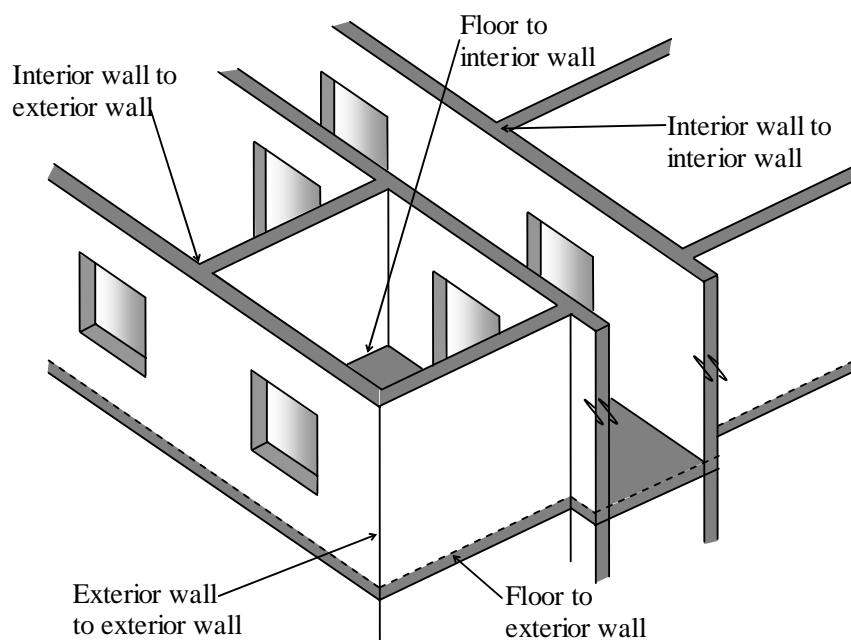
Various wall connections in a multi-storeyed masonry building
